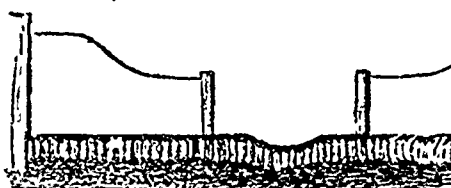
Cobble-Stone Pavement for Cow Houses.
